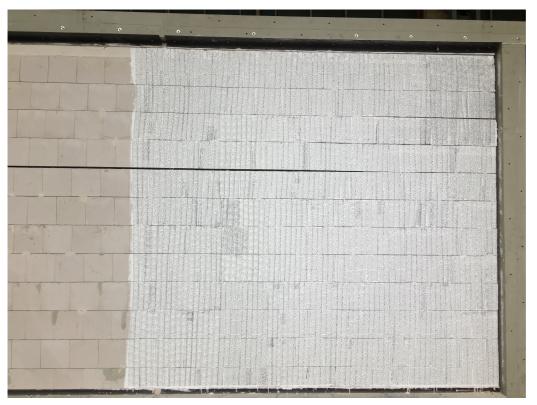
Test setup of 24 cm calcium silicate masonry test wall with CFRP textile insert Figure by Maik Erler, Bild06.jpg
